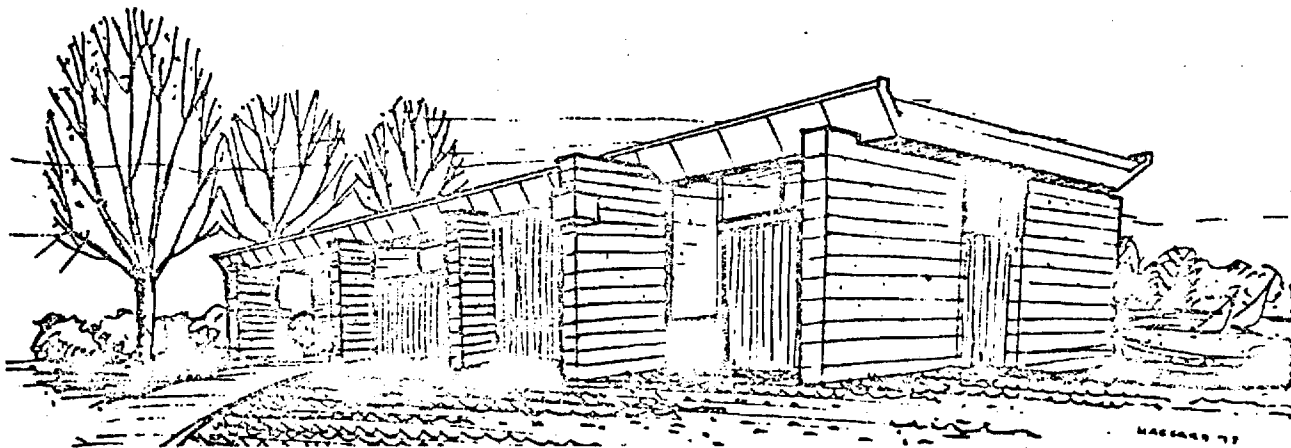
Solar Heated House with Roof Pond.⁴⁷
